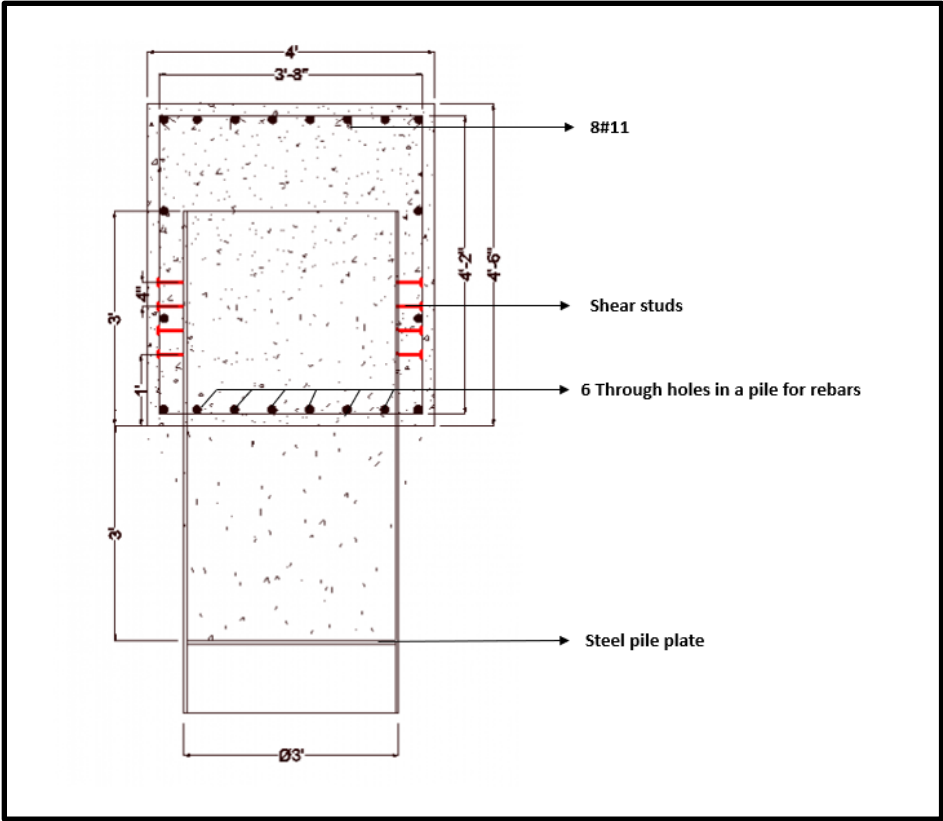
O5: Typical Specimen With Shear Studs Connection
